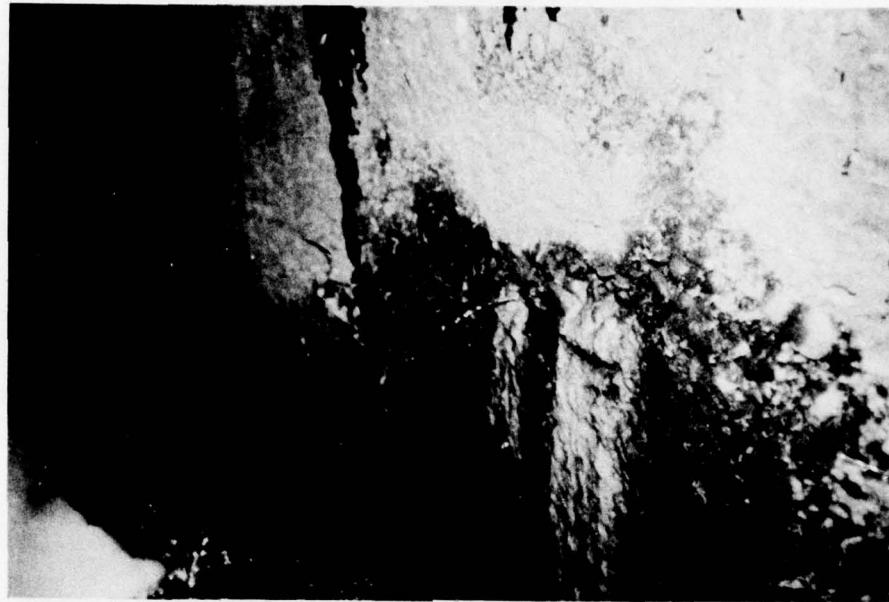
Mud and water flow through the wall of monolith 5 into the filling and emptying culvert of the landwall.
